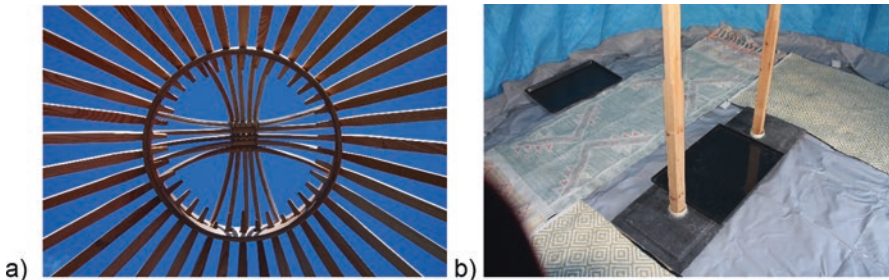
Small details can make the difference between success or failure like (a) the extension of the rafters well into the timber crown structure critical and (b) the anchoring of two crown support columns into bio-composite shoes to prevent displacement
